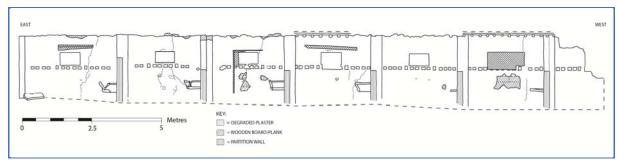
Elevation drawing of the north facing elevation of Structure 3.
